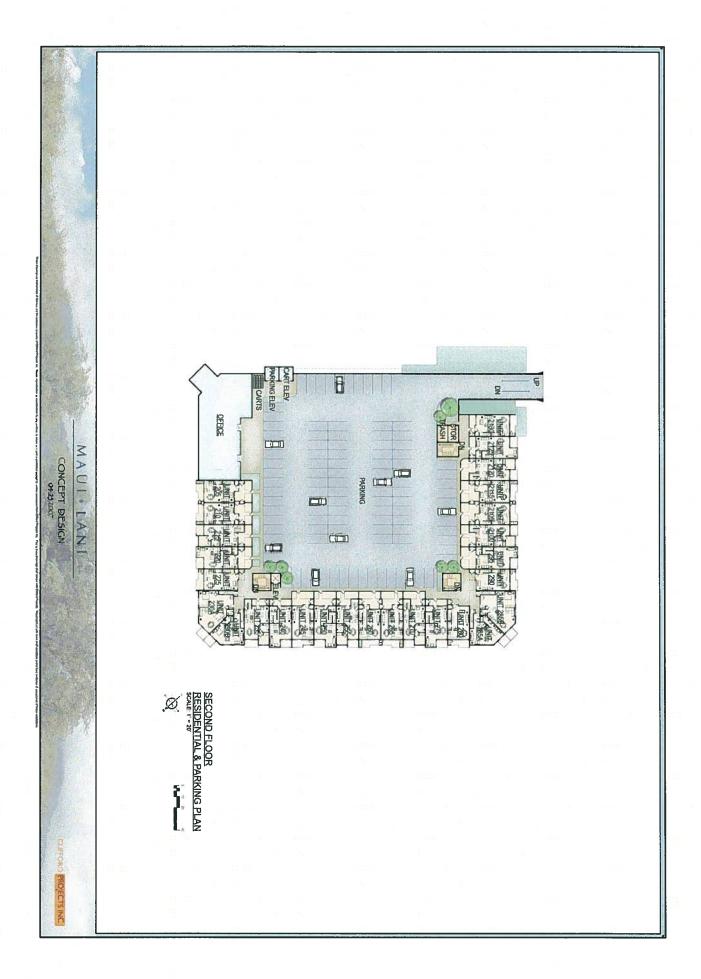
Maui Lani Mixed Use Second Floor Plan (Major Tenant B)
